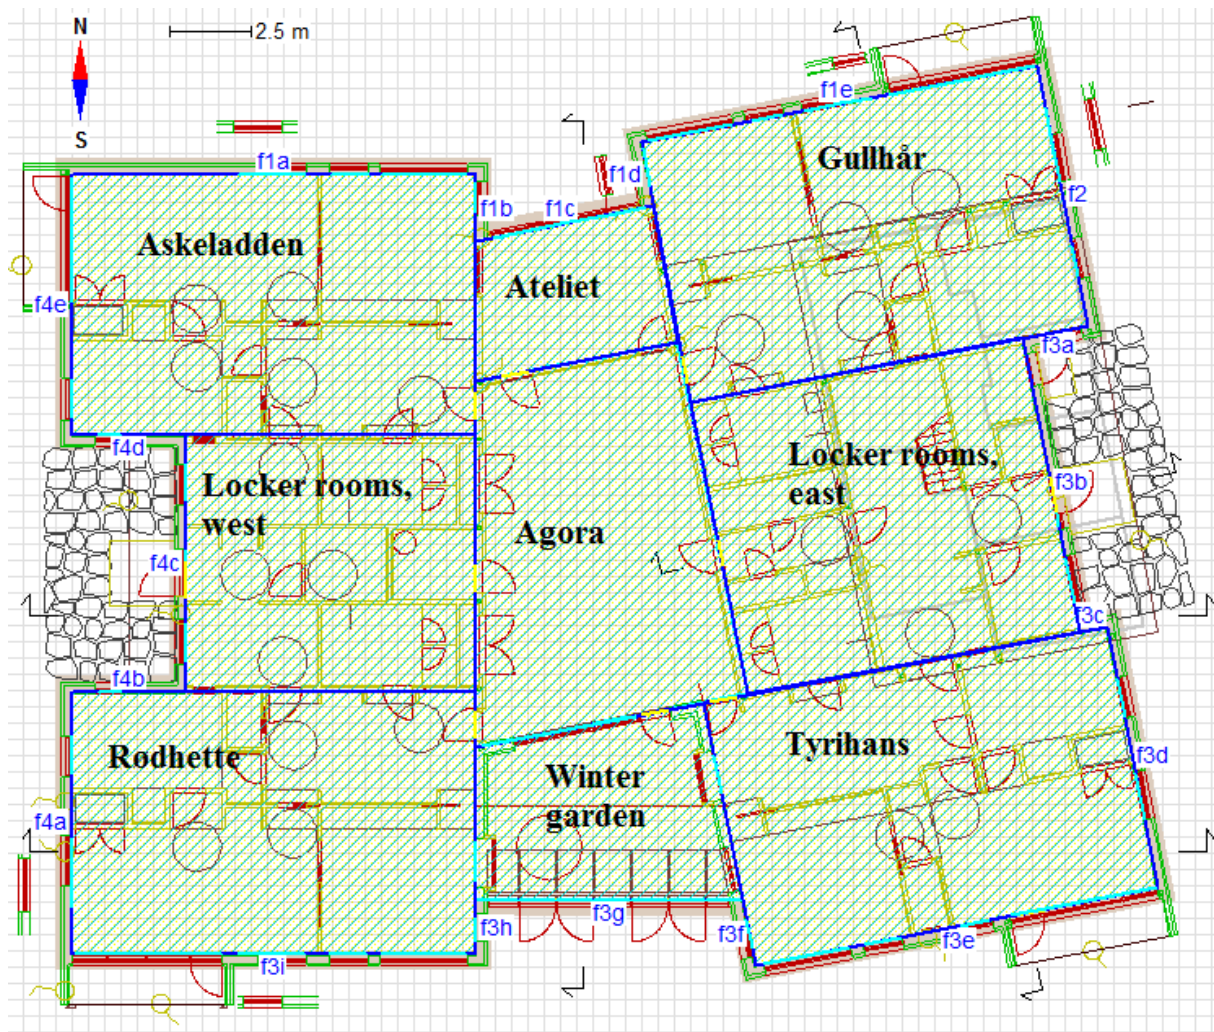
Plan drawing with zone division for the 1st floor at Solstad kindergarten.
